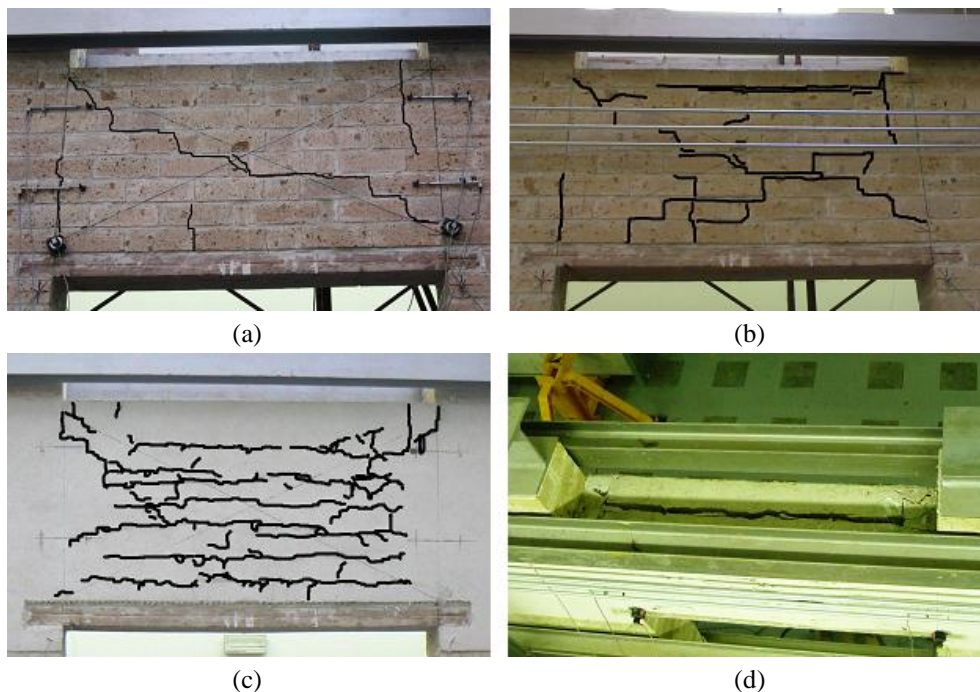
Damage to the spandrel panel: (a) as-built wall; (b) pre-damaged wall; (c,d) repaired wall
